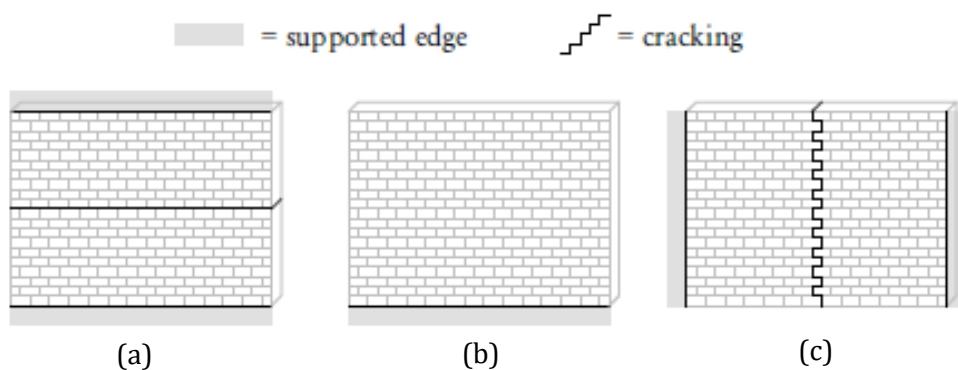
Typical out-of-plane flexural cracking patterns for one-way spanning walls with (a) double supported vertical span, (b) single supported vertical span and (c) double supported horizontal span (Vaculik, 2012)
